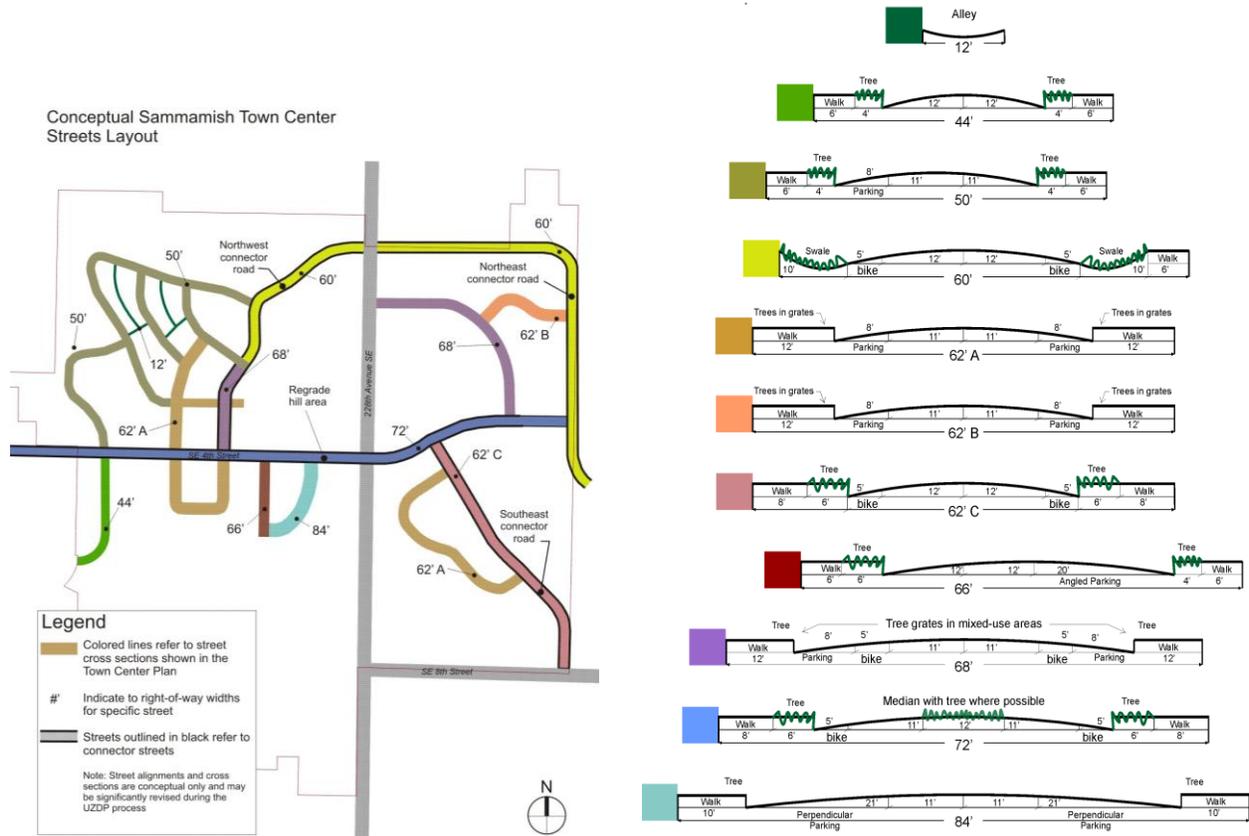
B.30.230a. Conceptual street cross-sections for the Town Center's roads. Colors next to each cross-section match those of roadway(s) shown in the conceptual plan to the left.
